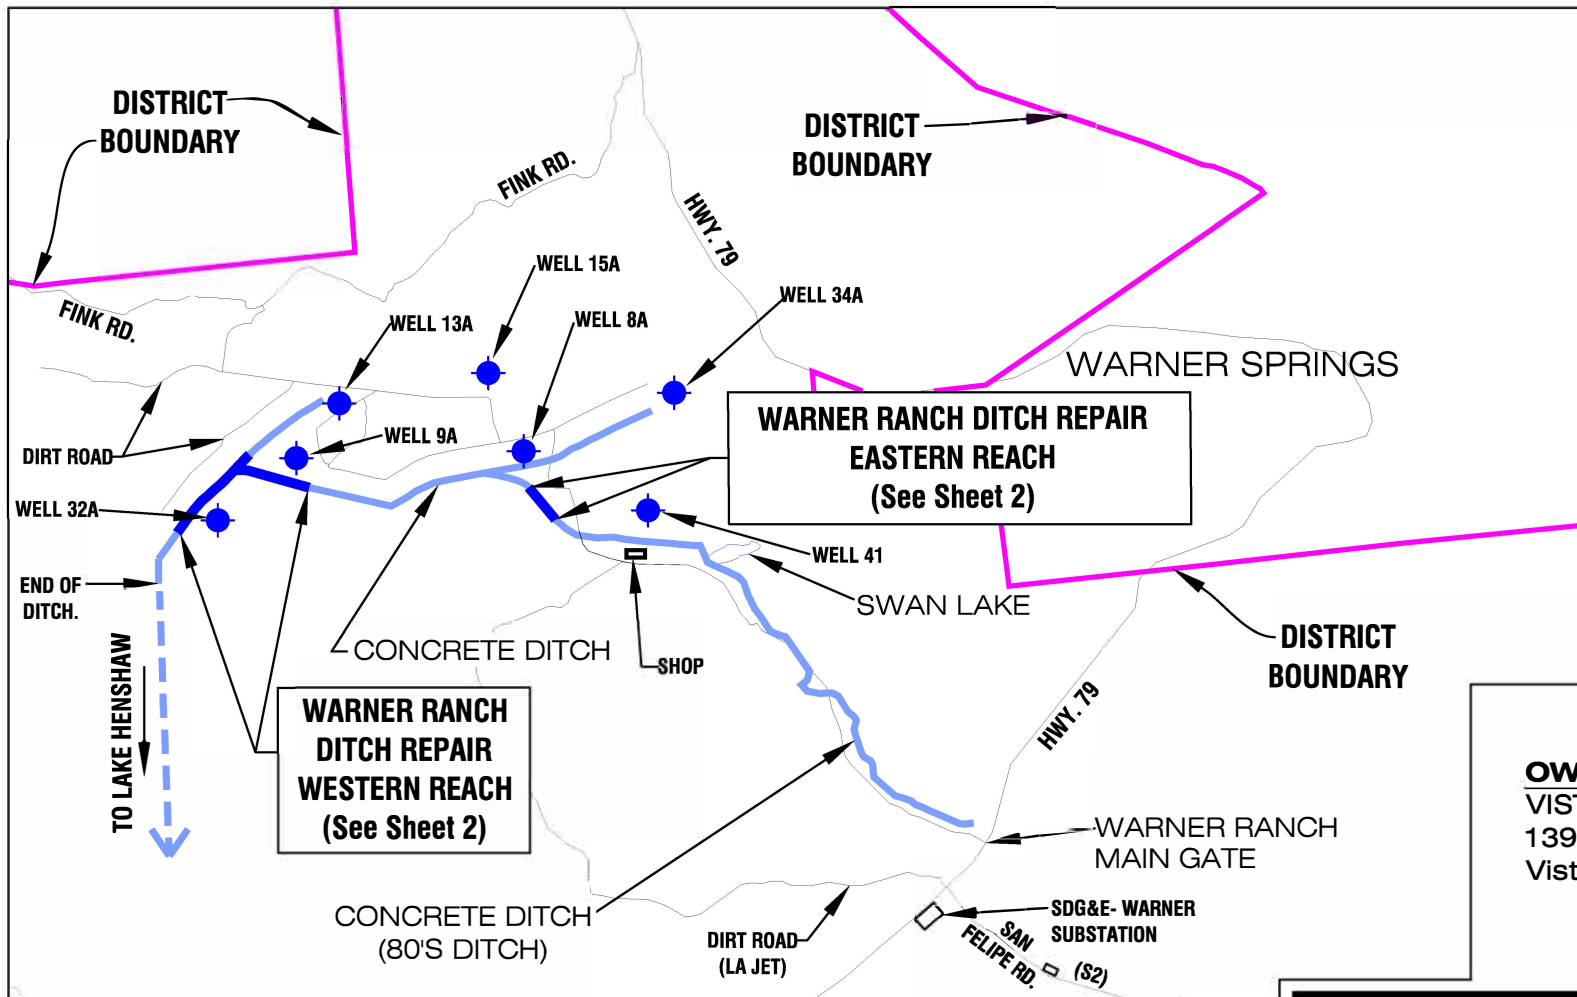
DETAILED REPORT: The Project consisted of installing approximately 3,601 feet of 36" Reinforced Concrete Pipe (RCP) and 905 feet of 24" RCP into the existing damaged concrete lined ditch. Filter fabric was installed in the ditch, and pipe was installed on top of and partially backfilled with ¾" crushed rock and capped with concrete. Eight manhole/cleanout structures with 8" Ductile Iron (D.I.) well connections one manhole/transition structure, one 8" D.I. well connection tapped into the 36" RCP, two headwalls, one concrete transition to the existing ditch and one connection to an existing siphon box were completed.
